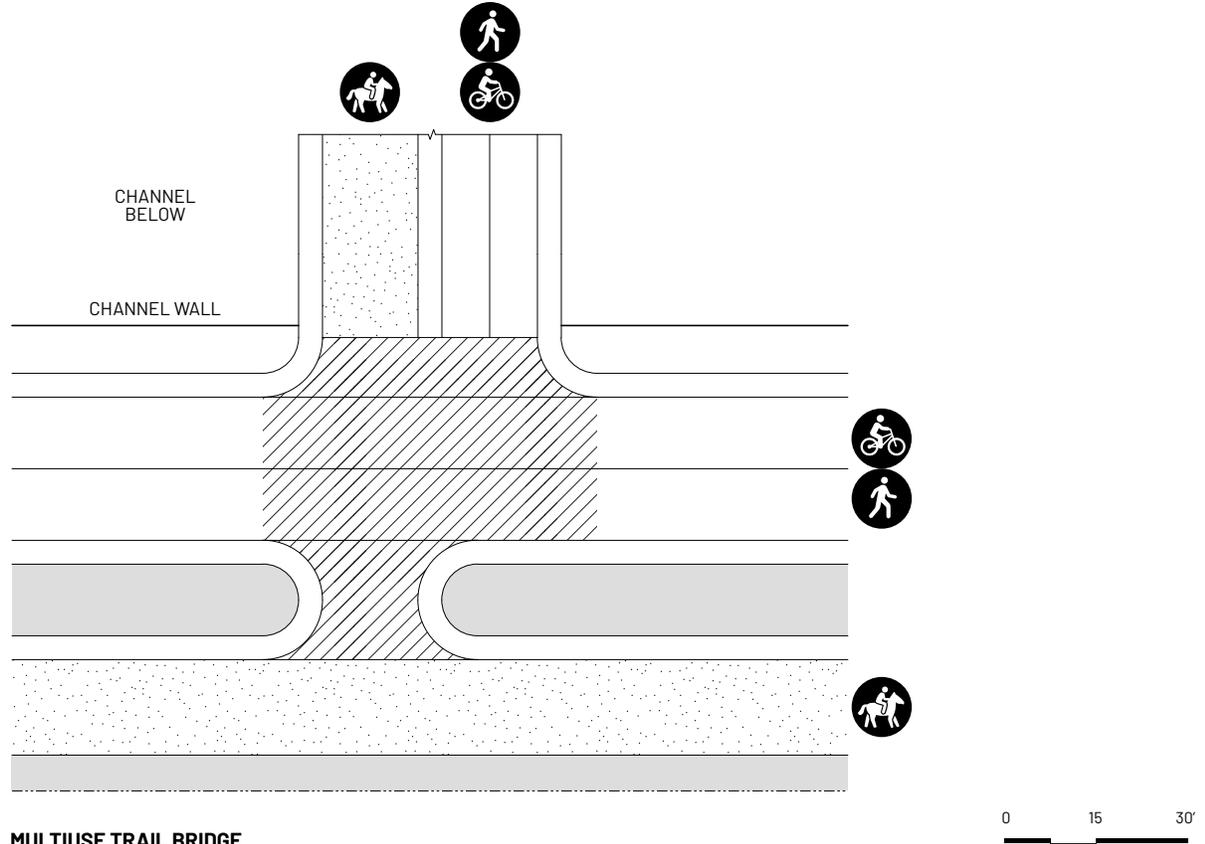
Bridge crossings are unique to the use of the bridge. The design, materiality, and form of each bridge should be determined based on the intended use. All bridge proposals shall be studied for hydraulic impacts on the flood capacity of the channel.
